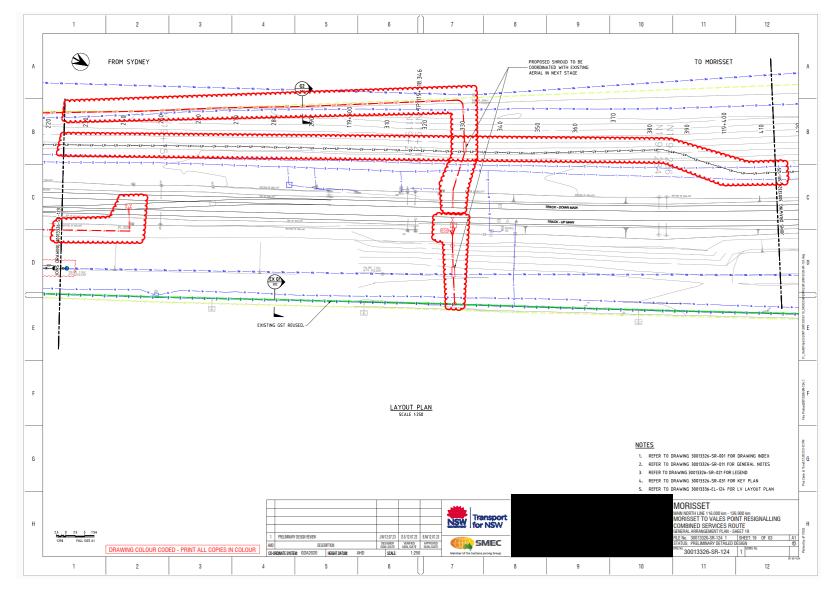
Proposed excavation works adjacent to Zone 2. Source: SMEC
